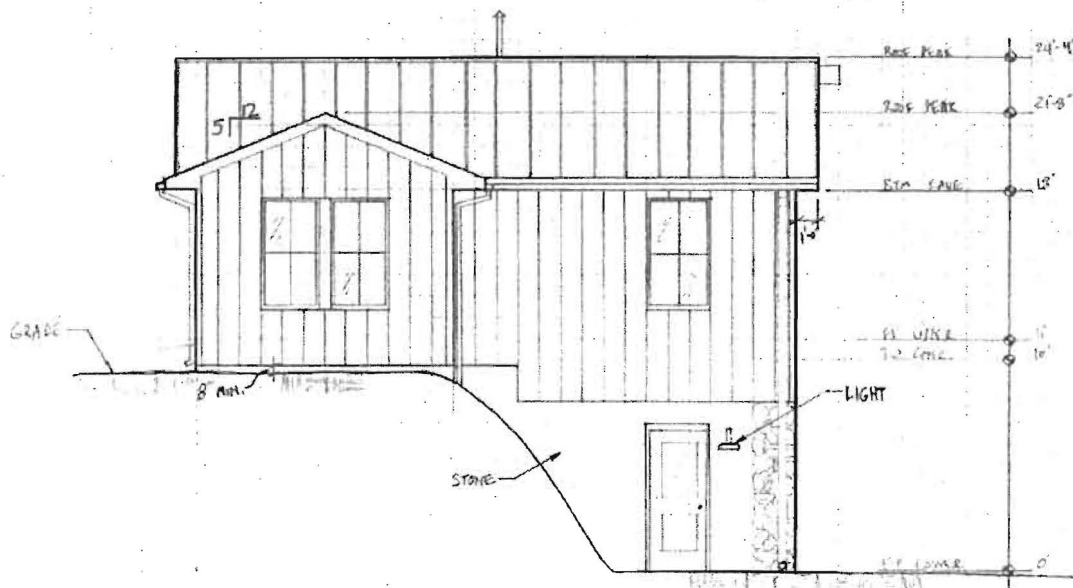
D.2 – South Elevation, Proposed Bank Barn / Accessory Structure
